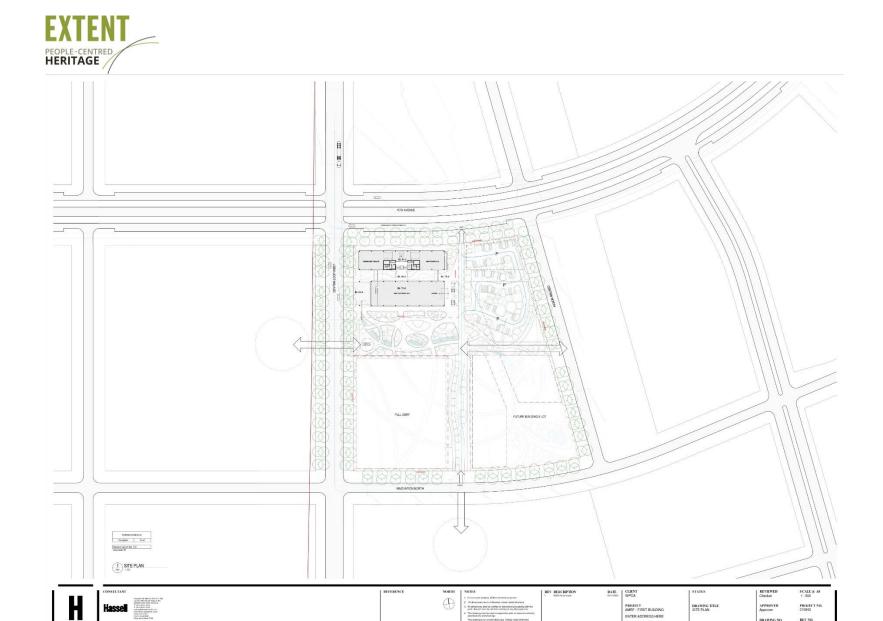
AMRF – First Building site plan (Architectural drawings prepared by Hassell, 2021).
